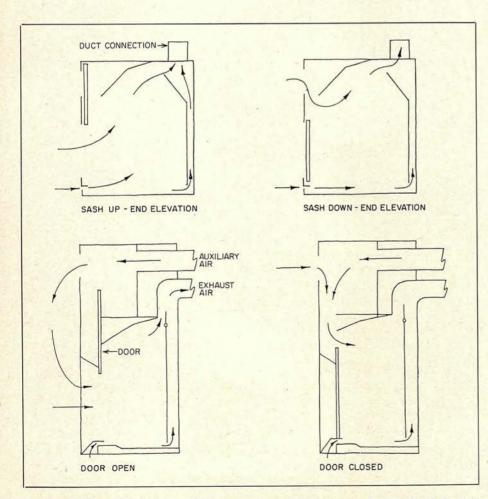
These hood designs help insure room air balance whether hood door is open or closed. Auxiliary air supply from outdoors cuts refrigeration load (bottom)
